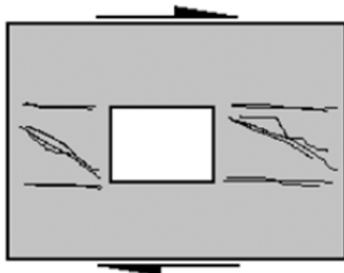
Possible Failure Limited in the Pier Portions
